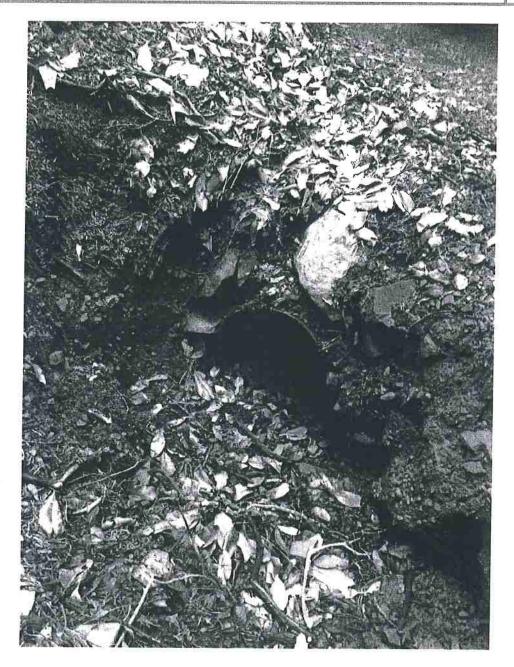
Crossing #2 inlet. Photo date 11-11-16
